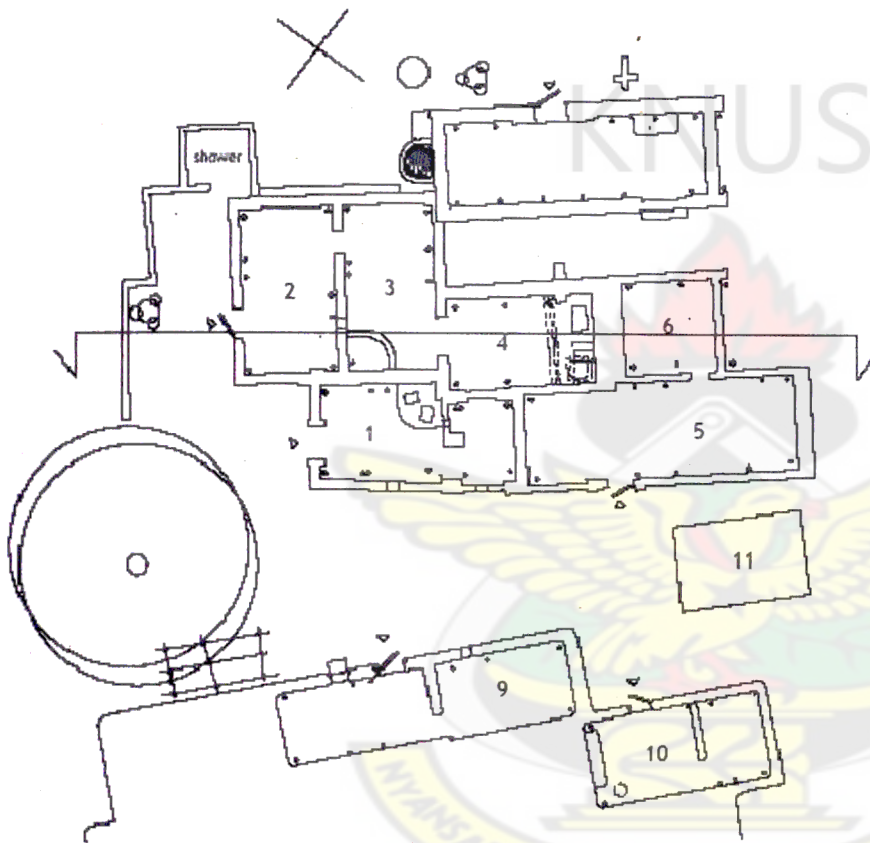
; Typical compound layout in Kaleo (Source: On-site measures AutoCAD drawing)
